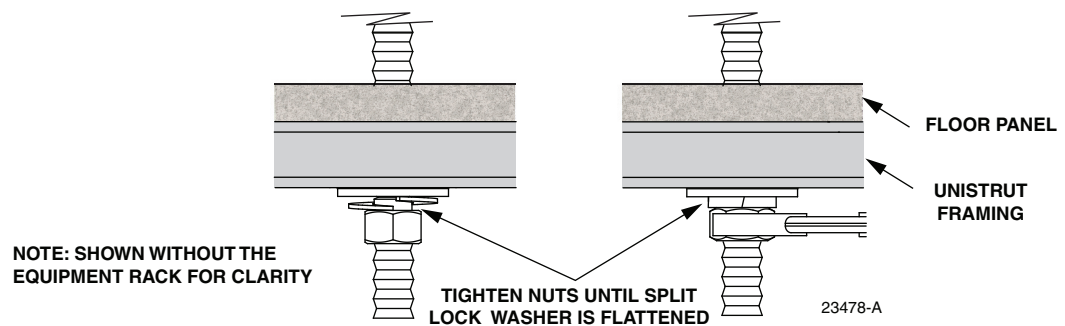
Raise Unistrut Sections to Bottom of Floor Panel
